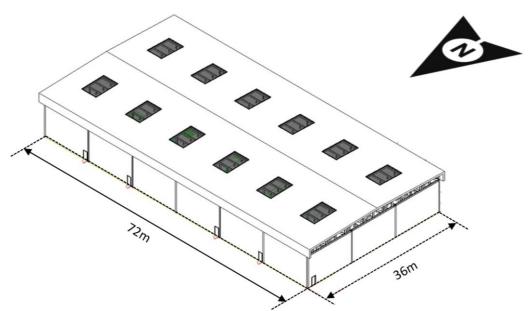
Factory CAD model after inserting the walls, roof, doors and skylight
